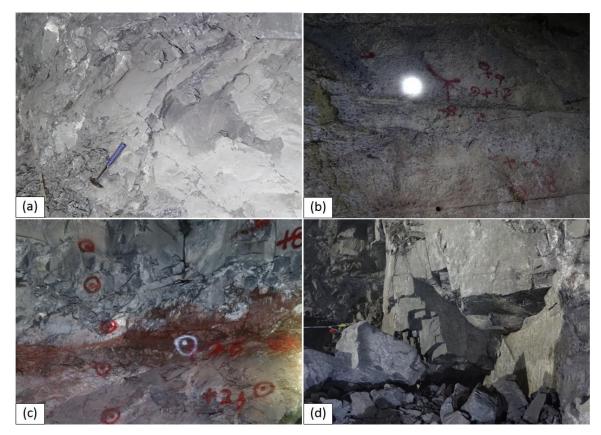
Rock mass structures in the main underground caverns; (a) fracturing, (b) bedding, (c) shear zone, (d) columnar joint sets
